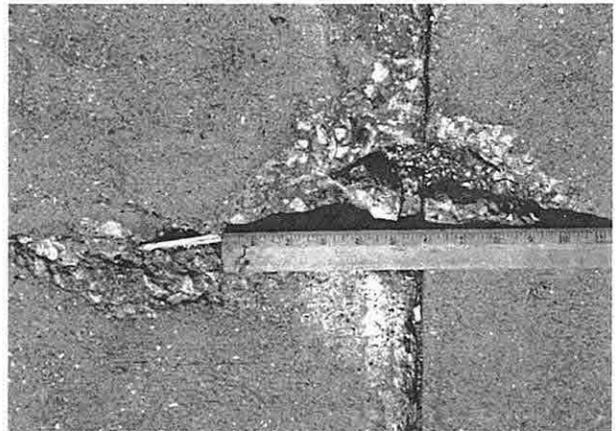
Medium-Severity Spalling, Corner
